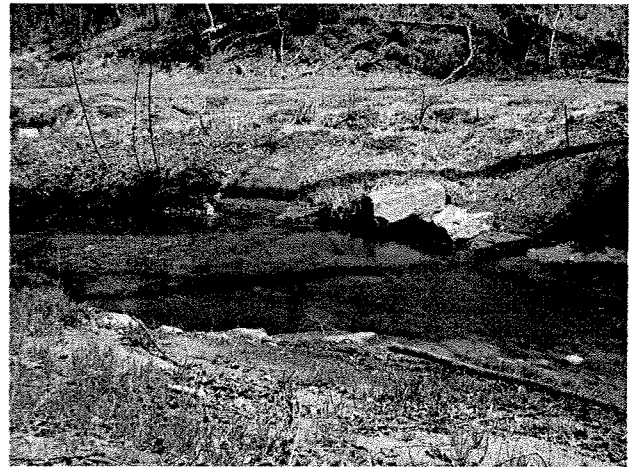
Looking downstream from culvert at rock J vane installed in existing MS channel. (9/27/04)
